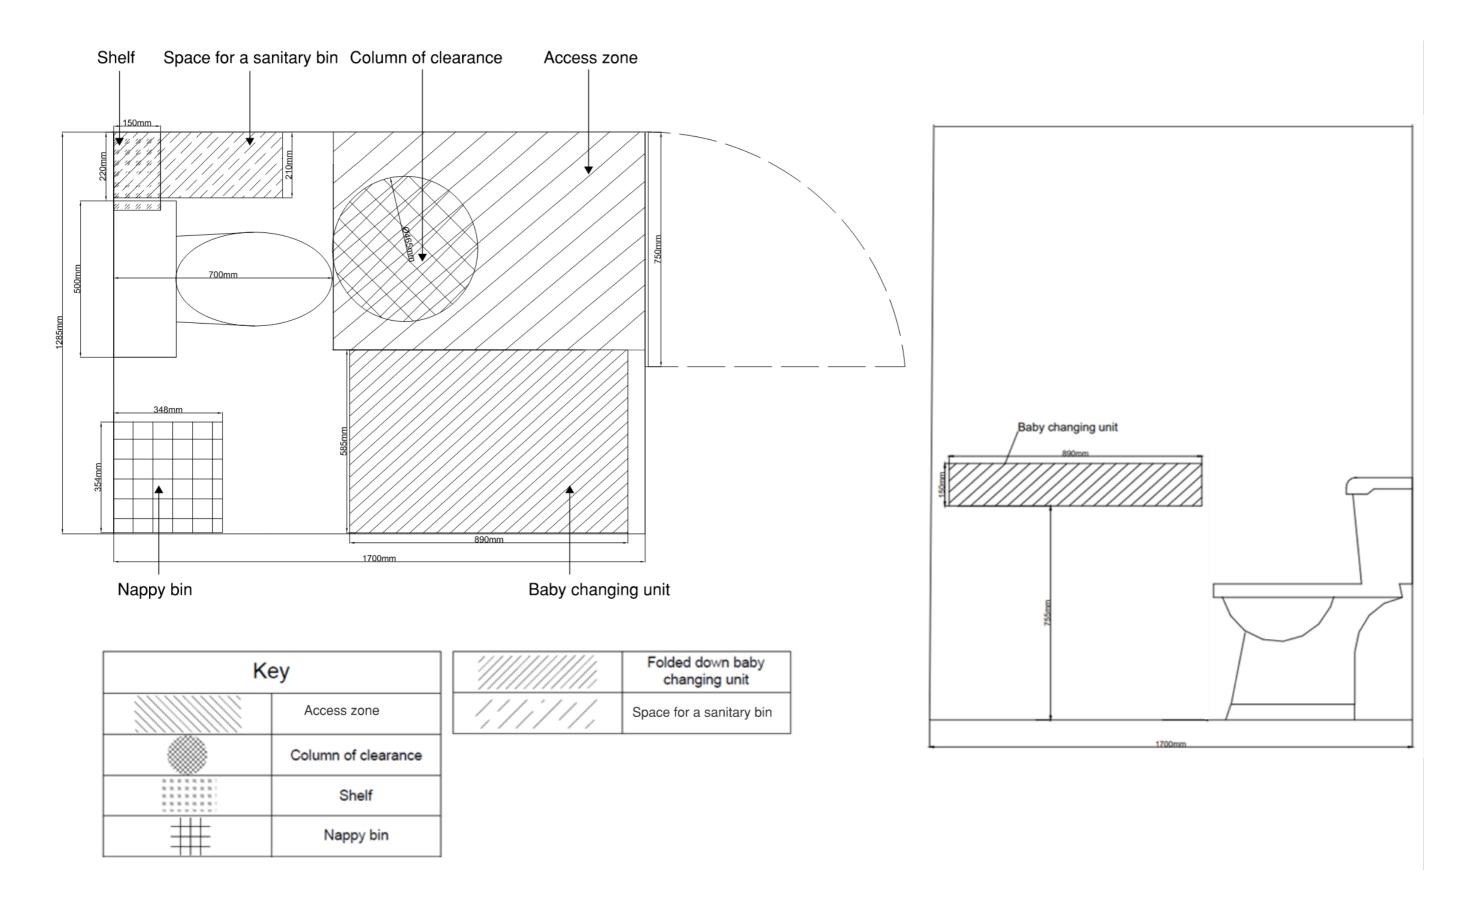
Indicative layout for enlarged cubicle with baby changing facilities (plan and elevation).
